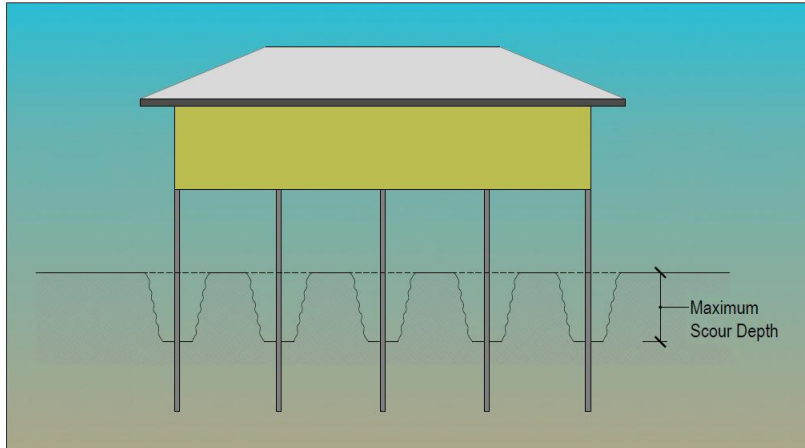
Unprotected Soil Treatment – ‘Queenslander’ Style Dwelling
